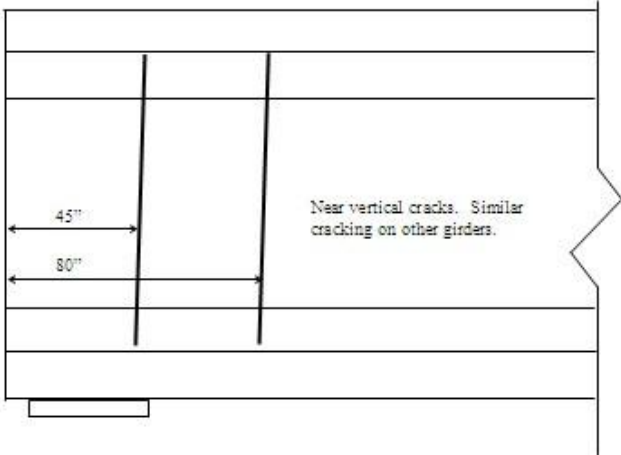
Crack Diagram For Girder 2nd From South Side, South Face, West Abutment (Bridge 19, #12773).
